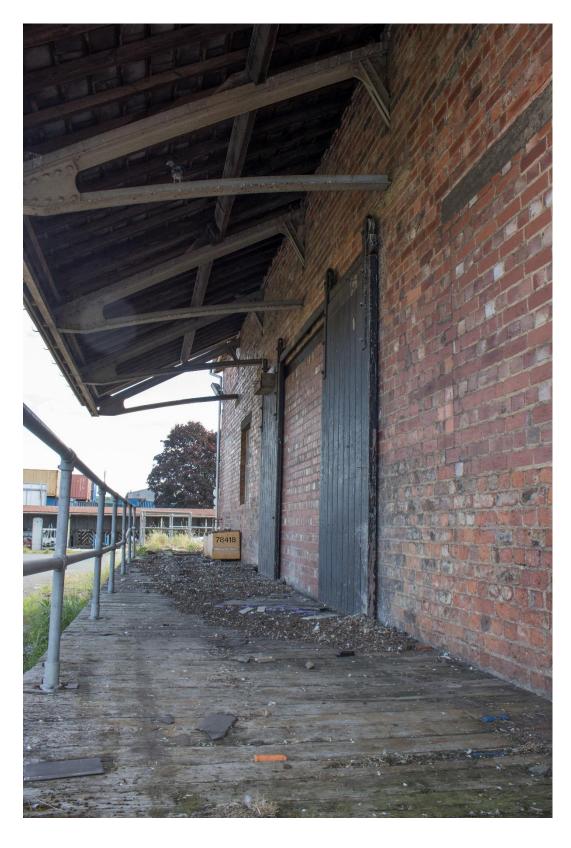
North elevation of the Locks Building showing raised platform and extending steel roof trusses for canopy
